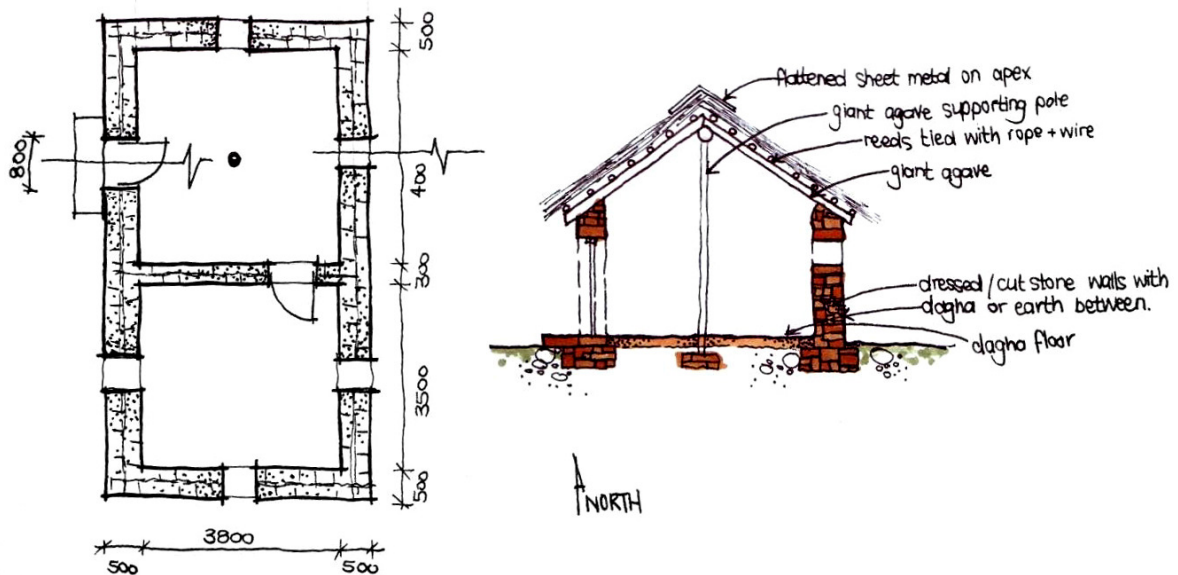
Plan and section sketches, illustrating rectangular dwellings with hipped roofs
